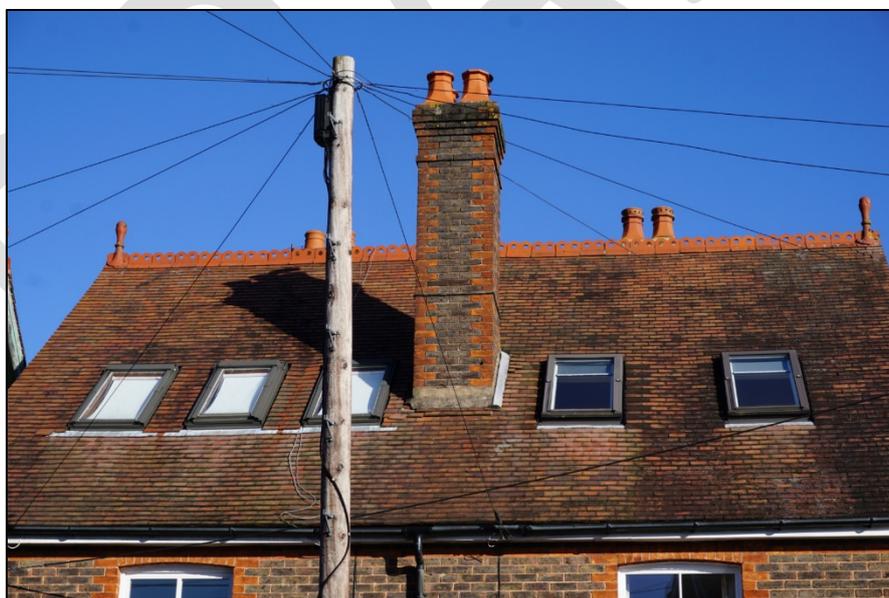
Two hole hexagonal crest ridge tiling with finials and red brick chimney stack quoins, Hazelwick Road.
